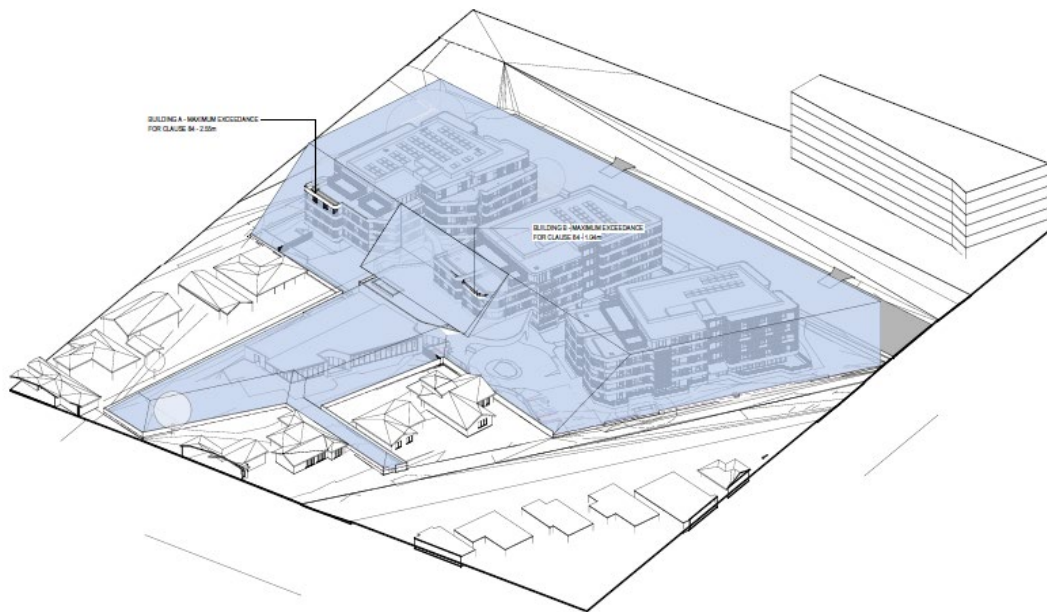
Proposed Building Envelope Diagram (Jackson Teece)
